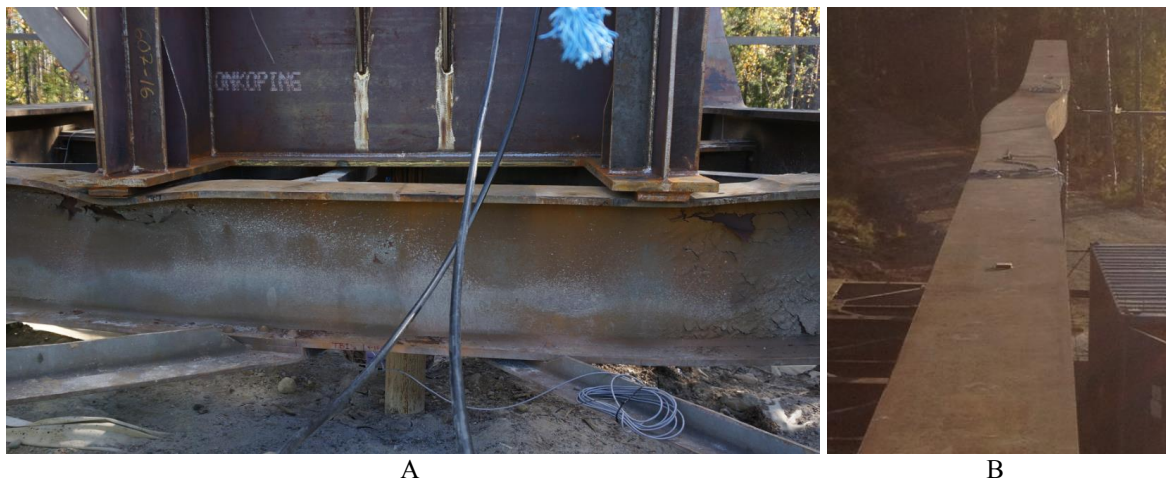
Left, the local failure of the longitudinal stringer beams. Right, the global failure mode, buckling of the top frame in the truss
